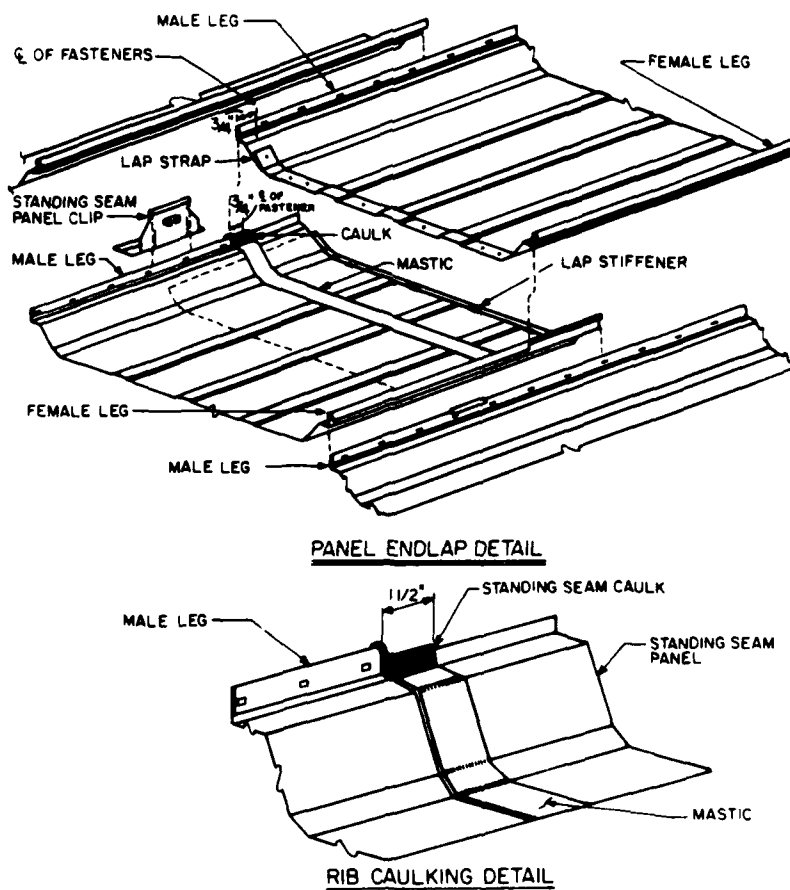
(a and b) Two views of floating lap joint with stiffener.
